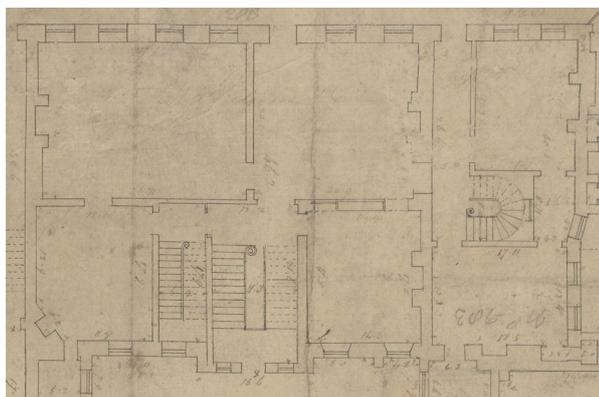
Ground Plans of Soho House, Greek Street. University of Nottingham Special Collections, Nottingham.⁷
